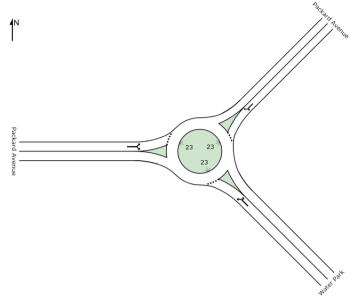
Sidra Model Layout future Chung Wah Terrace Extension / Packard Avenue
